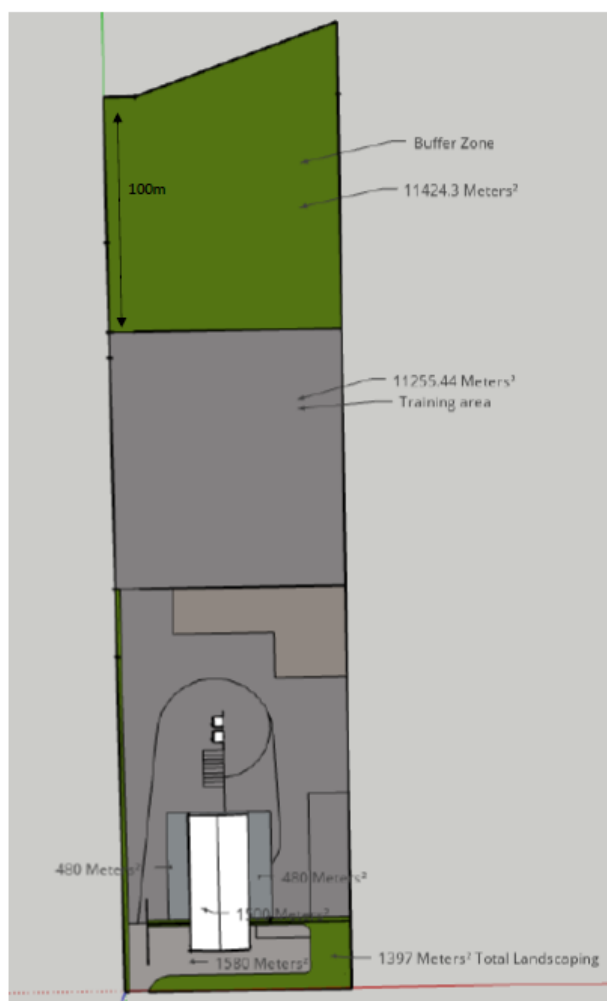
Preliminary Site Plan showing the location of proposed buildings, hardstand and training areas.
